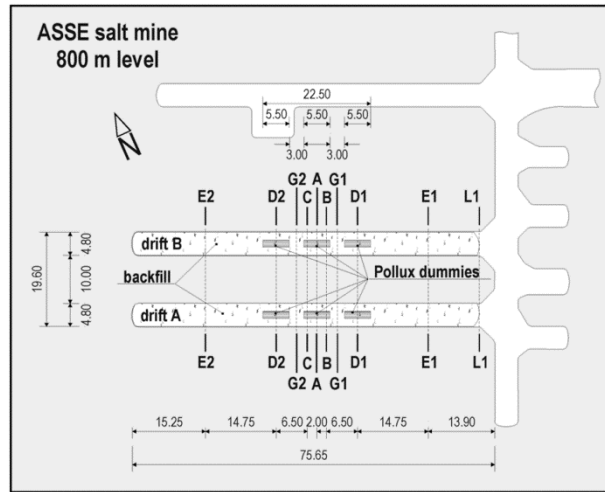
TSDE test: plan view of the test drifts and of the monitoring cross-sections.
